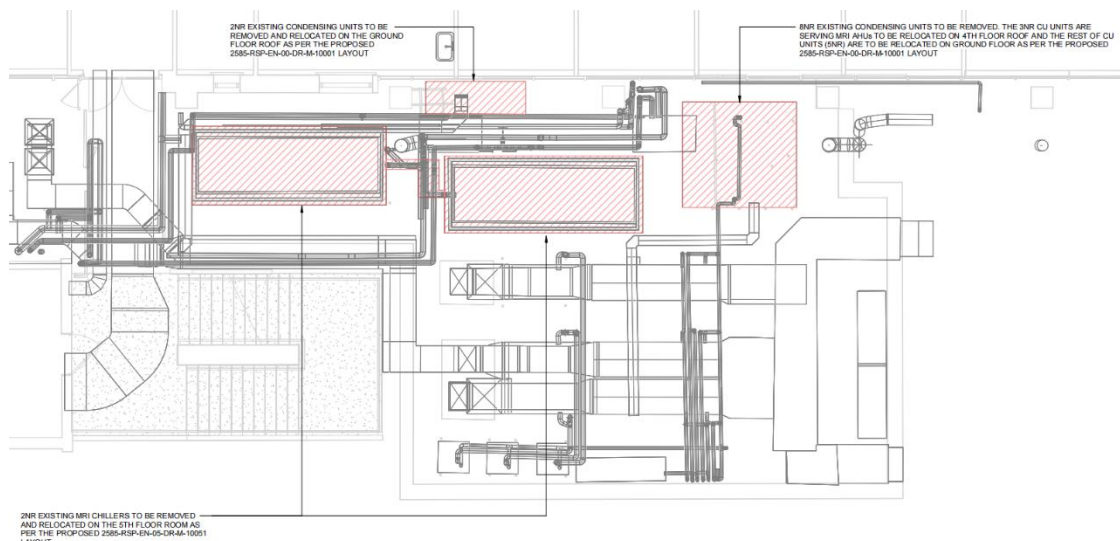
Relocation of existing 2no. chillers & 10no. condensing units currently placed on 1st Roof floor (over MRI-4 suite). The 2no. chillers will be temporarily relocated on the 5th Roof floor; 7no. condensing units, serving MRI ancillary spaces, will be relocated temporarily on the ground floor; 3no. condensers, serving MRI AHU's will be permanently allocated on 4th roof floor, inside a vacant enclosure.
